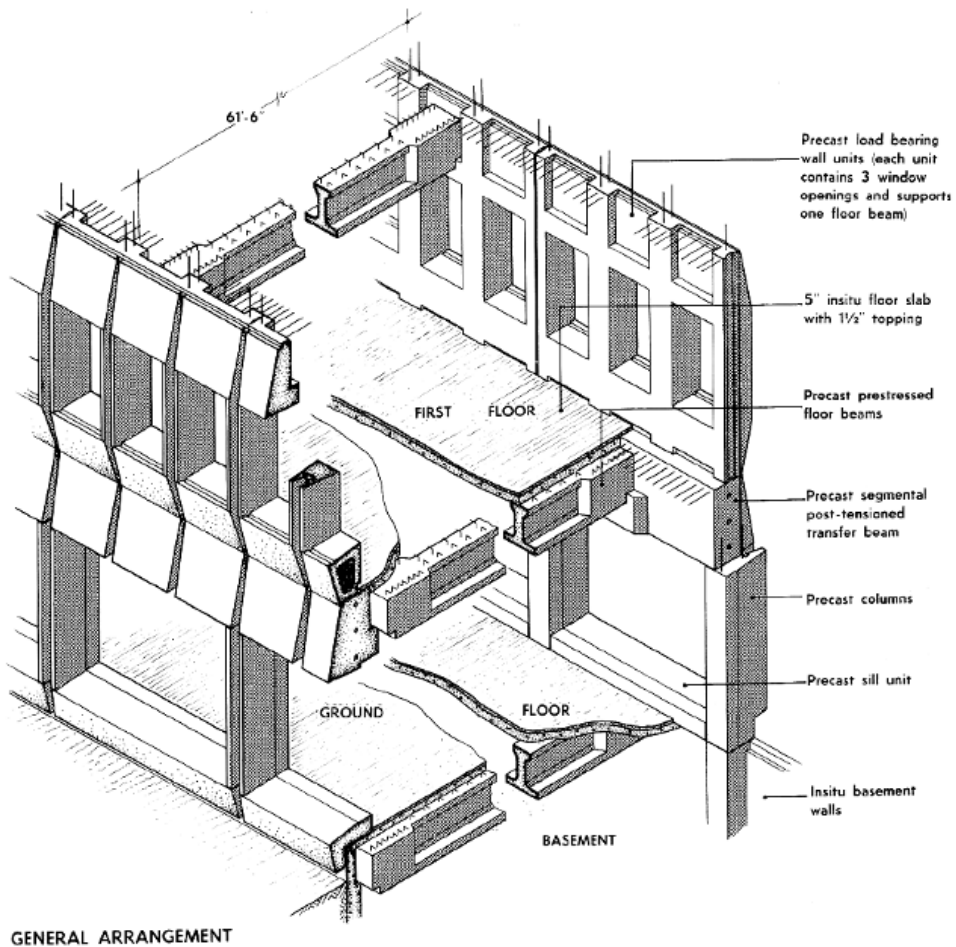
NRMA House cross-section showing construction methods (*Constructional Review* 1971)
